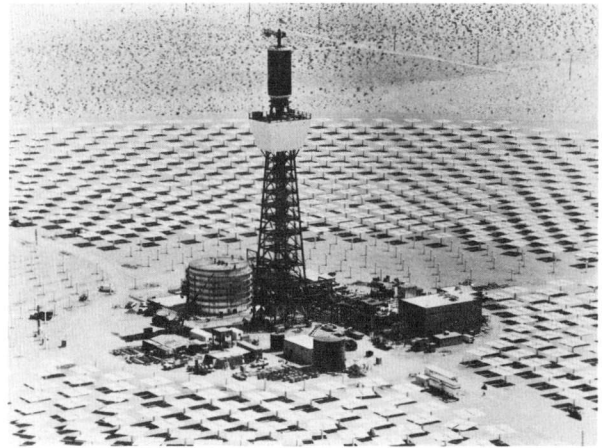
Aerial View of Barstow Pilot Plant Under Construction, July 1981
